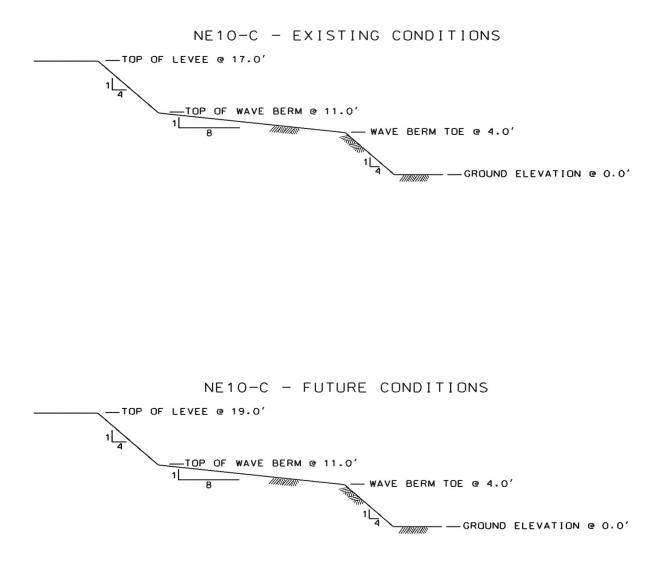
Typical Levee Design Cross-sections South Point to Hwy 90 Levee (NE10-C)
